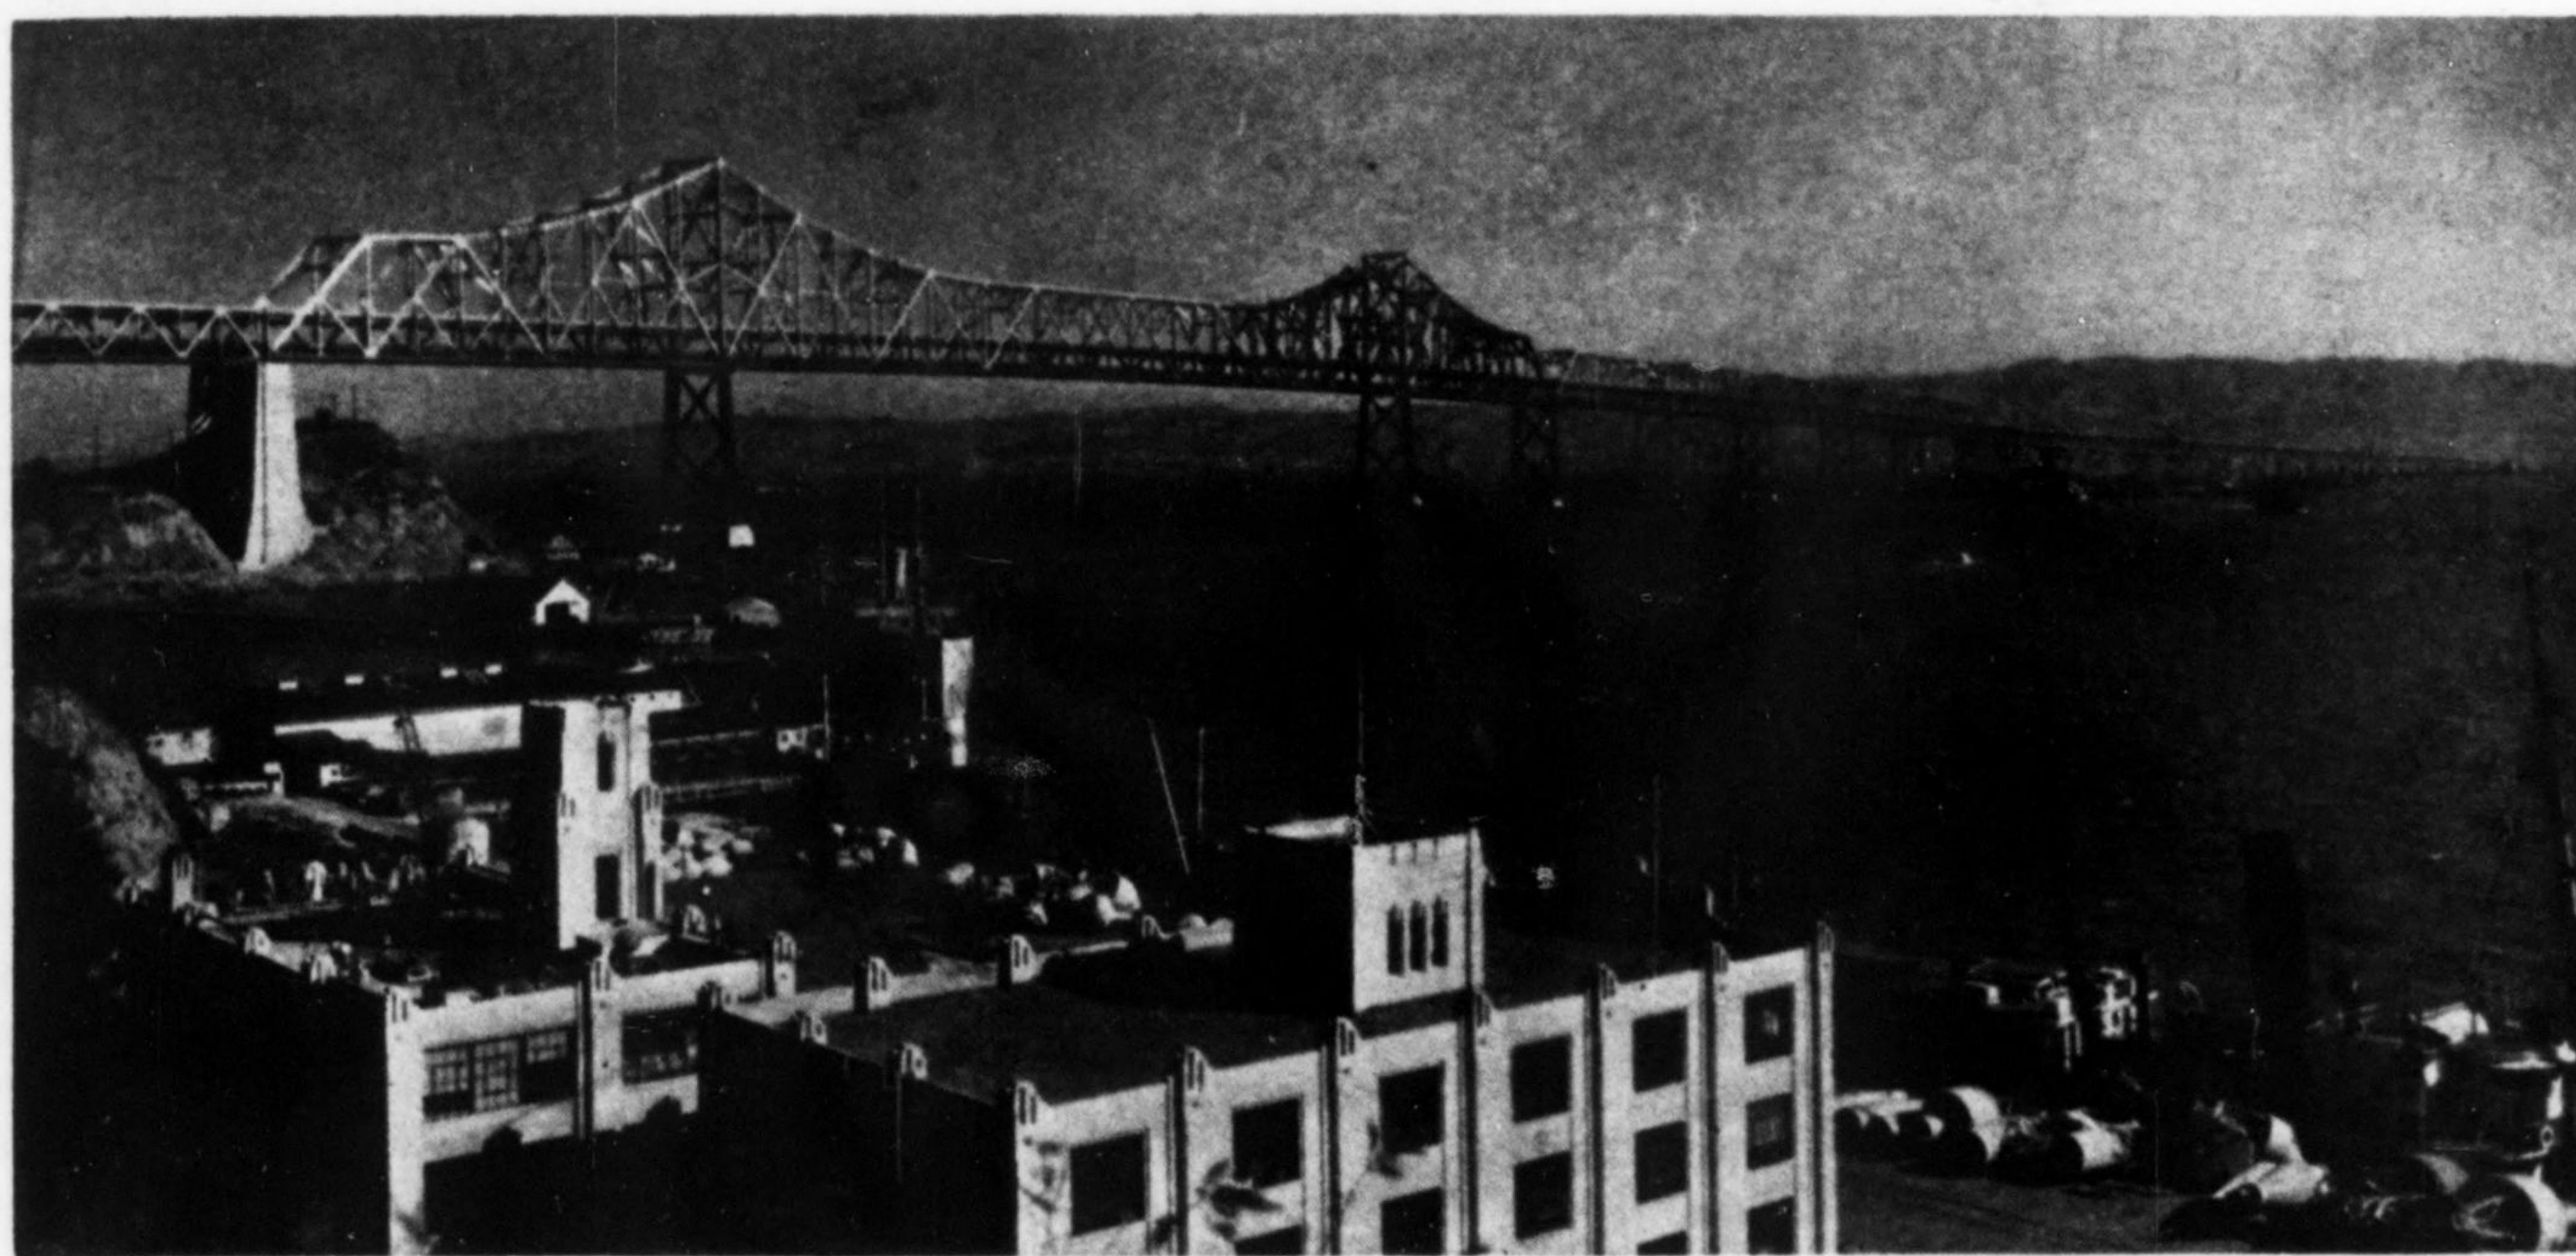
THE 1,400-FT. CANTILEVER of the East Bay crossing. Beyond are the 504-ft. spans and the 288-ft. spans.
